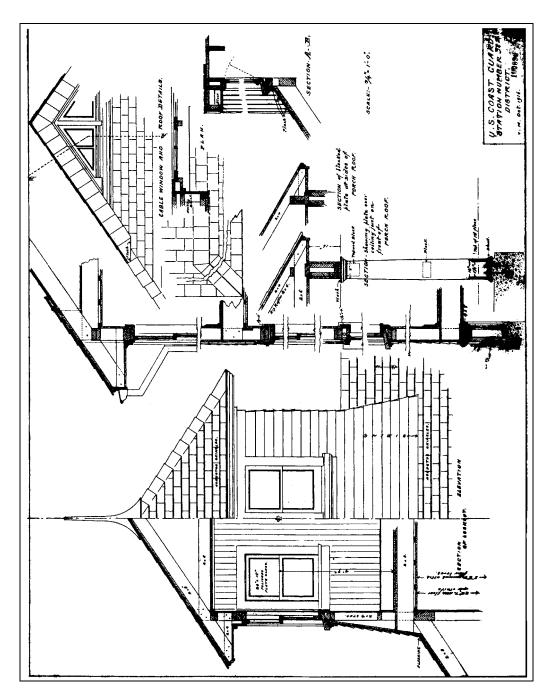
Siuslaw River Lifeboat Station, Monitor and Wall Section, October 1916. Source: U.S. Coast Guard Civil Engineering Unit, Oakland, CA.
